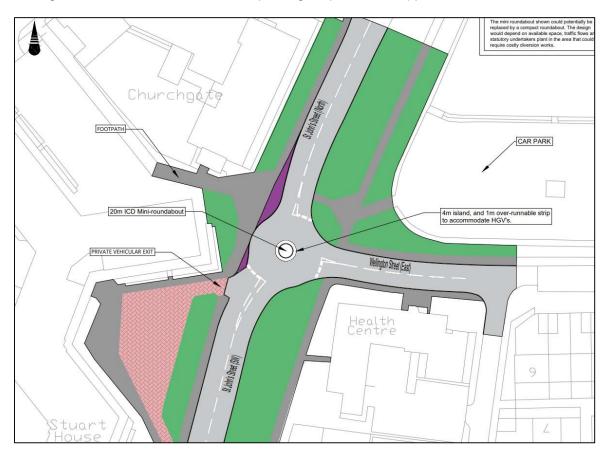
Concept Design of St John's Street / Wellington Street Junction Improvements
